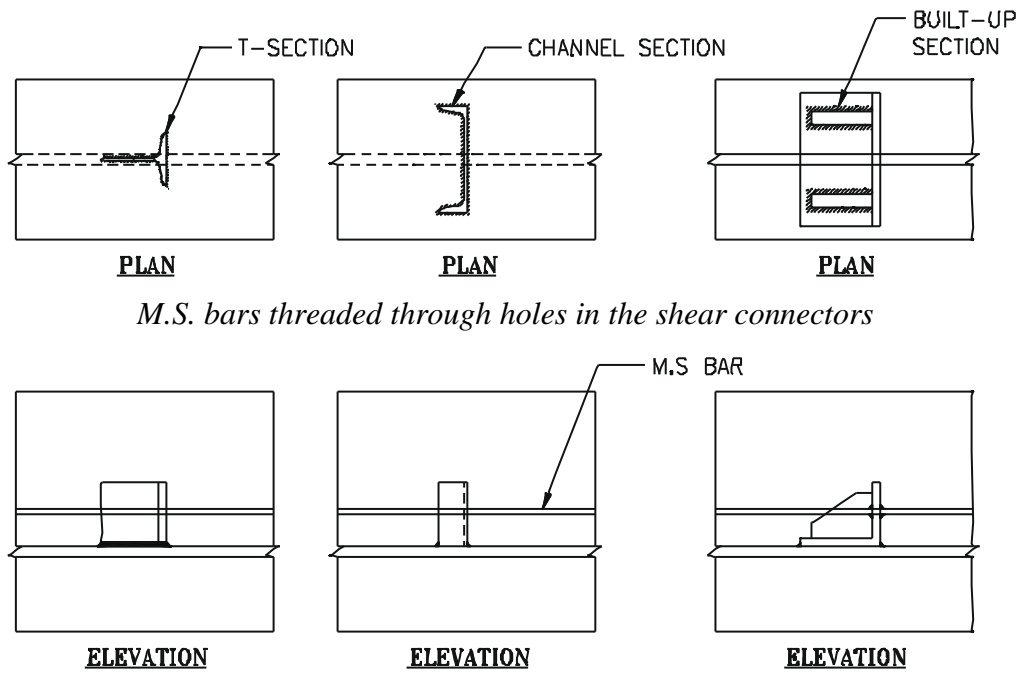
(a). Typical rigid connectors with anchorage device to hold down the concrete slab against uplift
